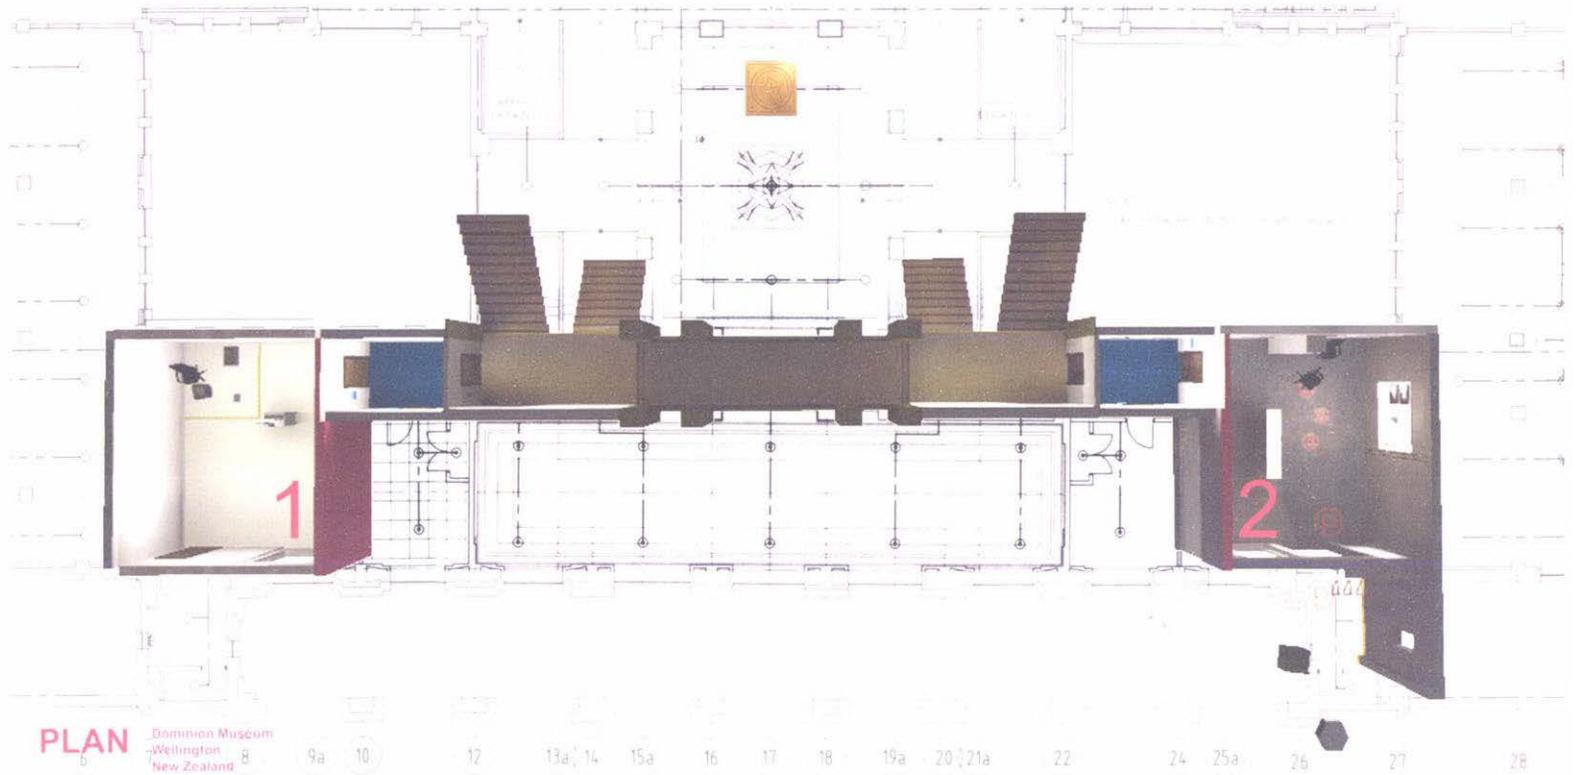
Plan of site, Dominion Museum, Wellington New Zealand 'Being @' , (Author, 2006).
